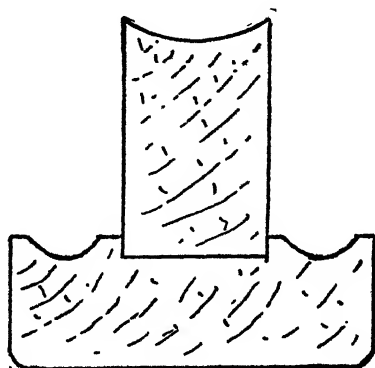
Crossbar or rafter with concave top, and gutters to carry water to side of frame.
